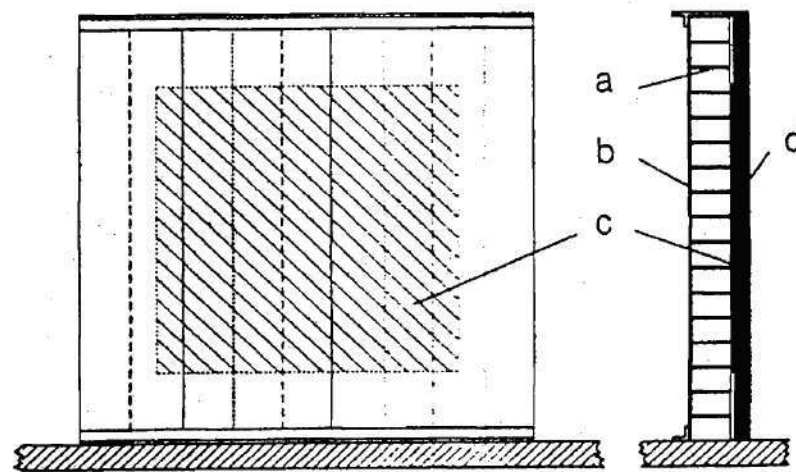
Schematic of test setup (taken from Kolsch, 1998); (a) masonry wall; (b) overlay; (c) pressurized airbag; (d) reaction wall
